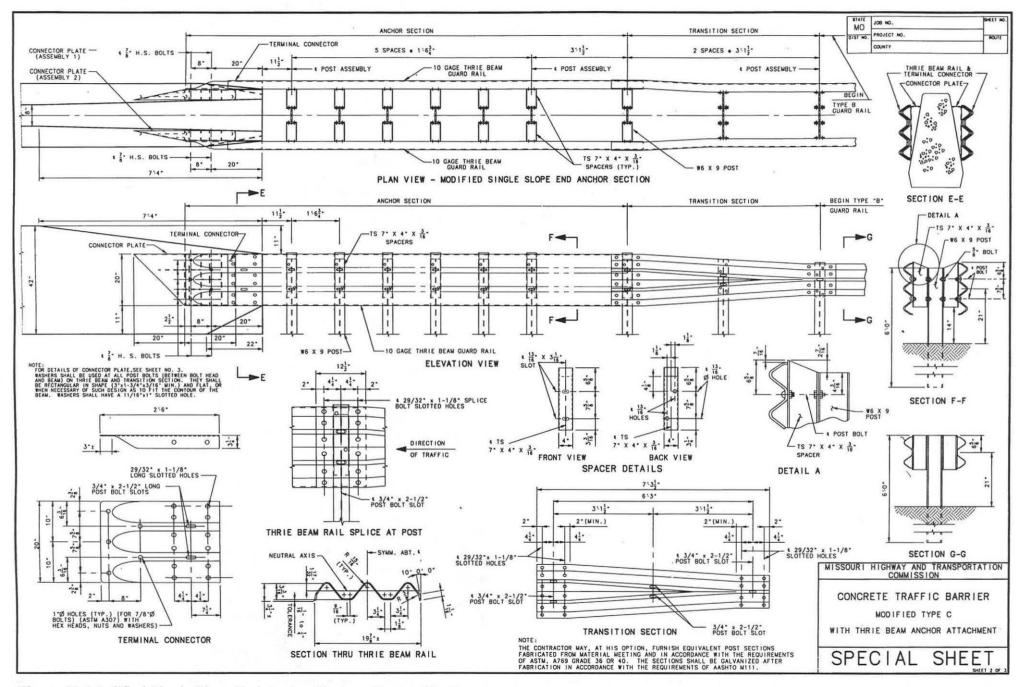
Modified Single Slope End Anchor Design, Design No. 2
